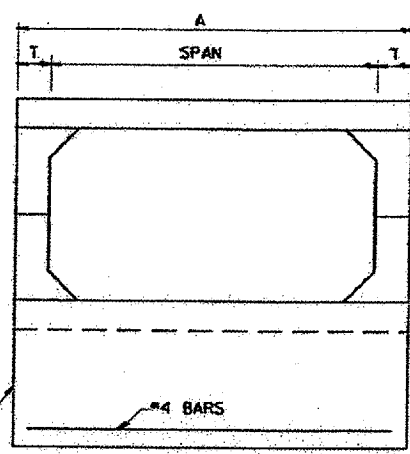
DETAIL OF PRECAST CONCRETE BOX CULVERT END SECTION
